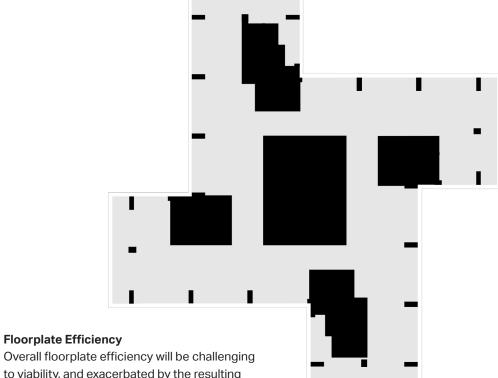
Impact of changes on existing structural floor slab for residential use
